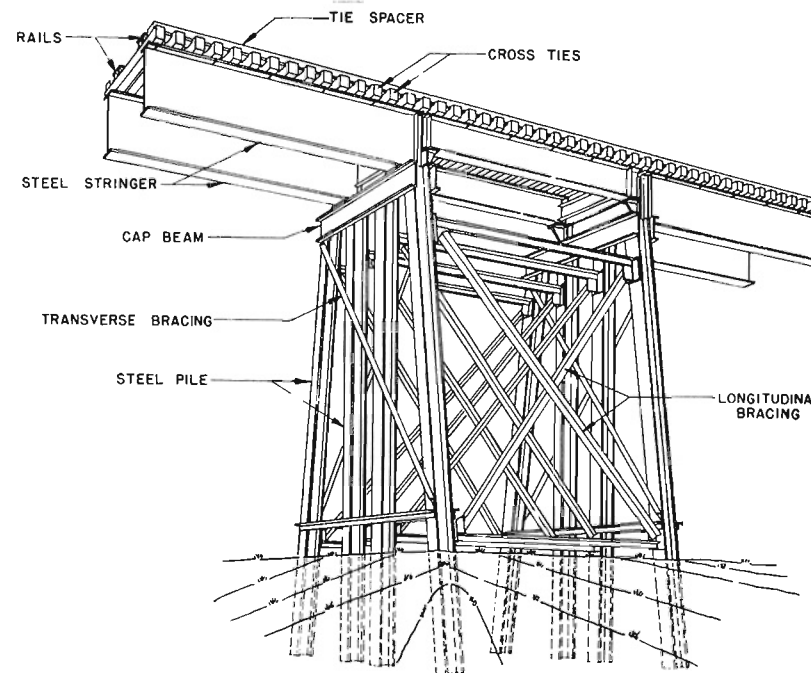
Railway bridge, steel stringers on braced steel pile bents.
